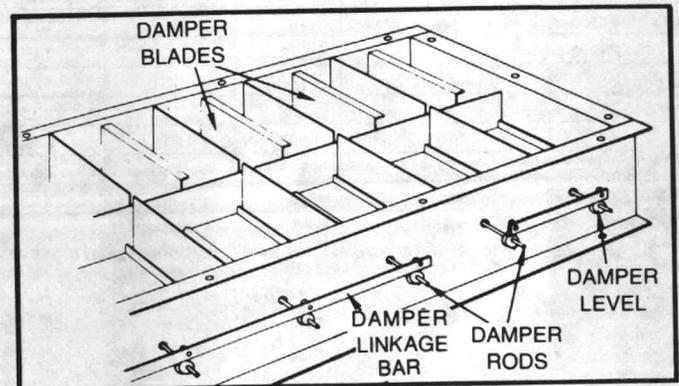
A - Setting the Zone Damper Rods and Damper Linkage
